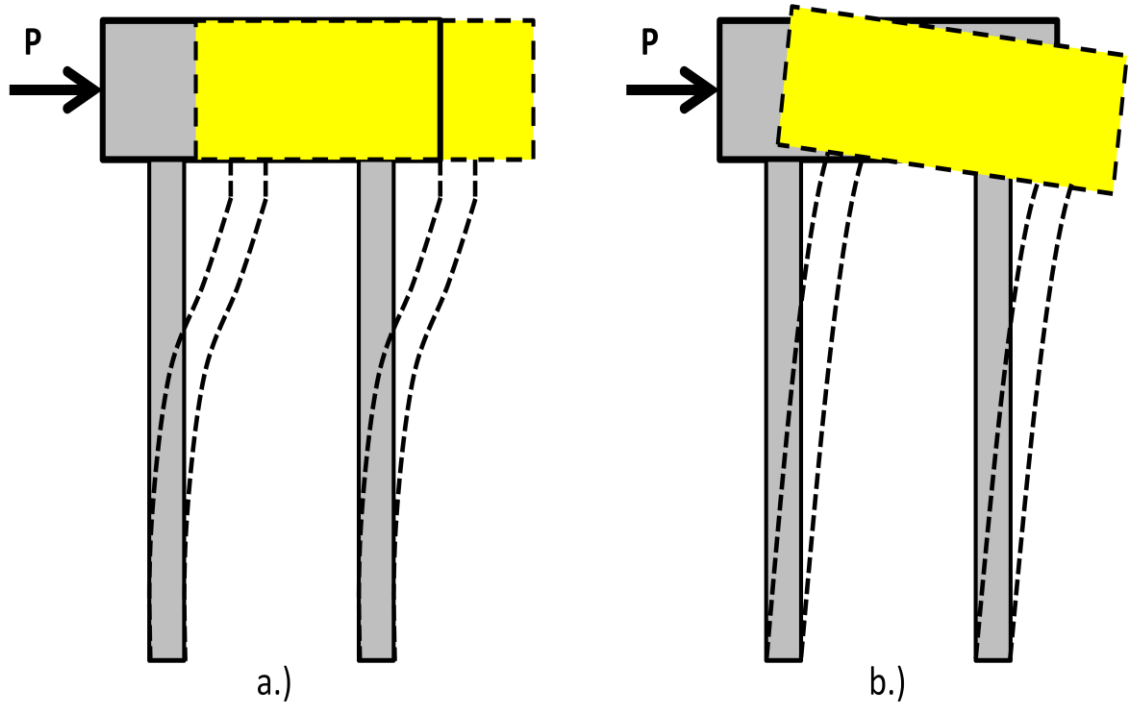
Pile cap deflection a.) Fixed pile-cap connection b.) Free pile-cap connection
